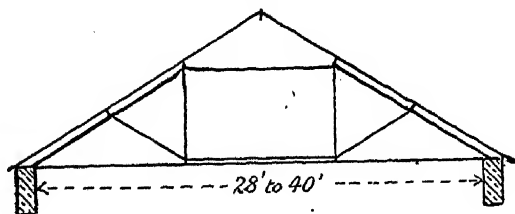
Line Diagram of a Queen-post Roof Truss.
